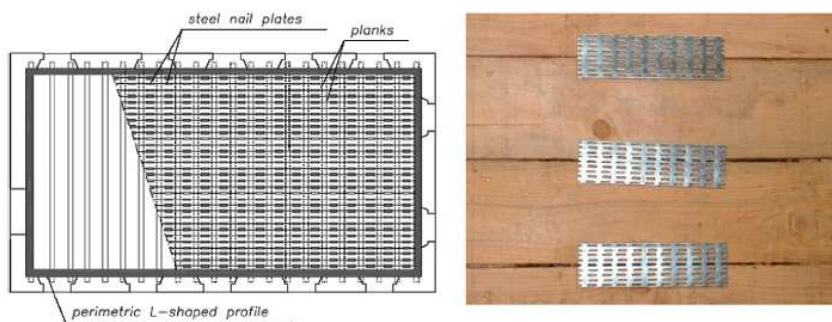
Use of steel plates to connect timber floor's plank [3].
